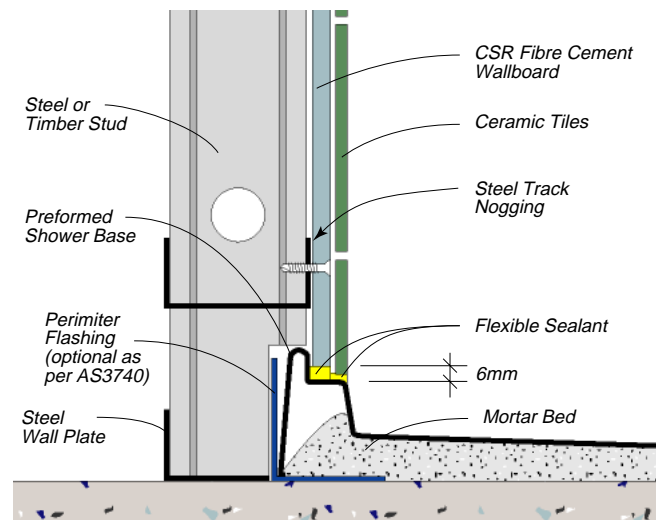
PREFORMED SHOWER BASE ON CONCRETE FLOOR.
